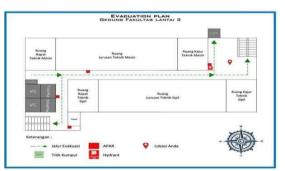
3rd Floor Engineering Faculty Building Layout
